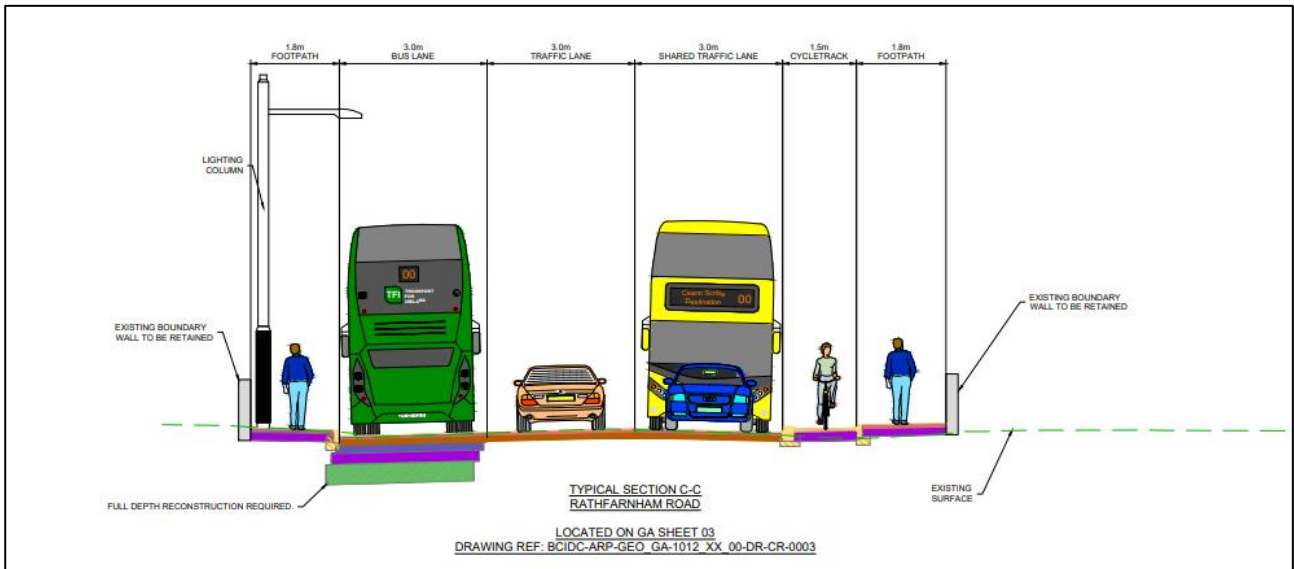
Typical Cross-Section adjacent to Village Green
